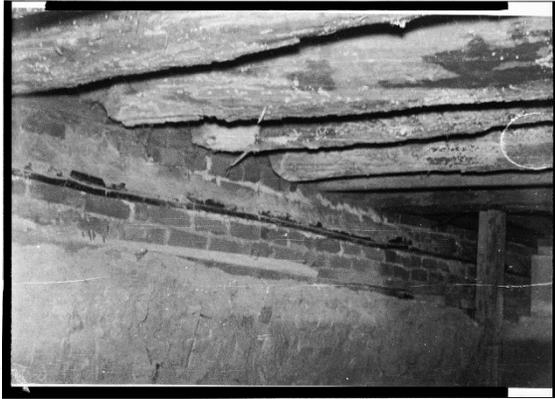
Floor beams in the basement bearing on the brick masonry foundation ca. 1960. (Photo courtesy of HABS).
